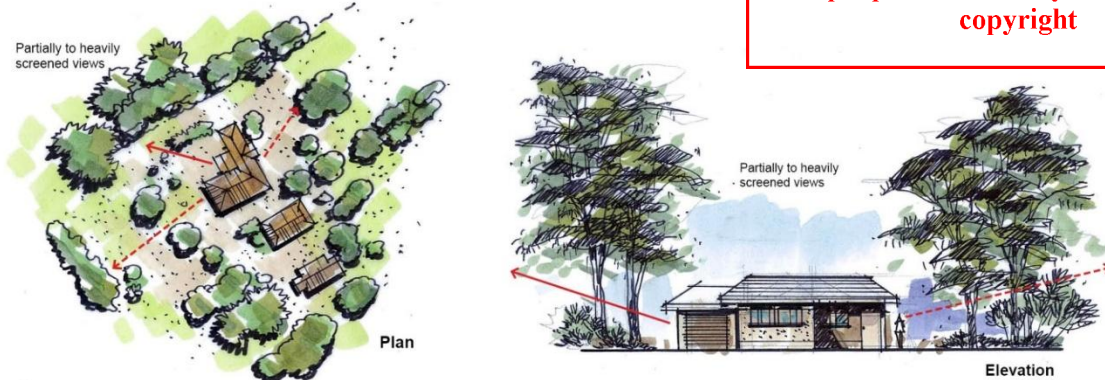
Typology 2 – Partially screened. Typical plan and elevation.
